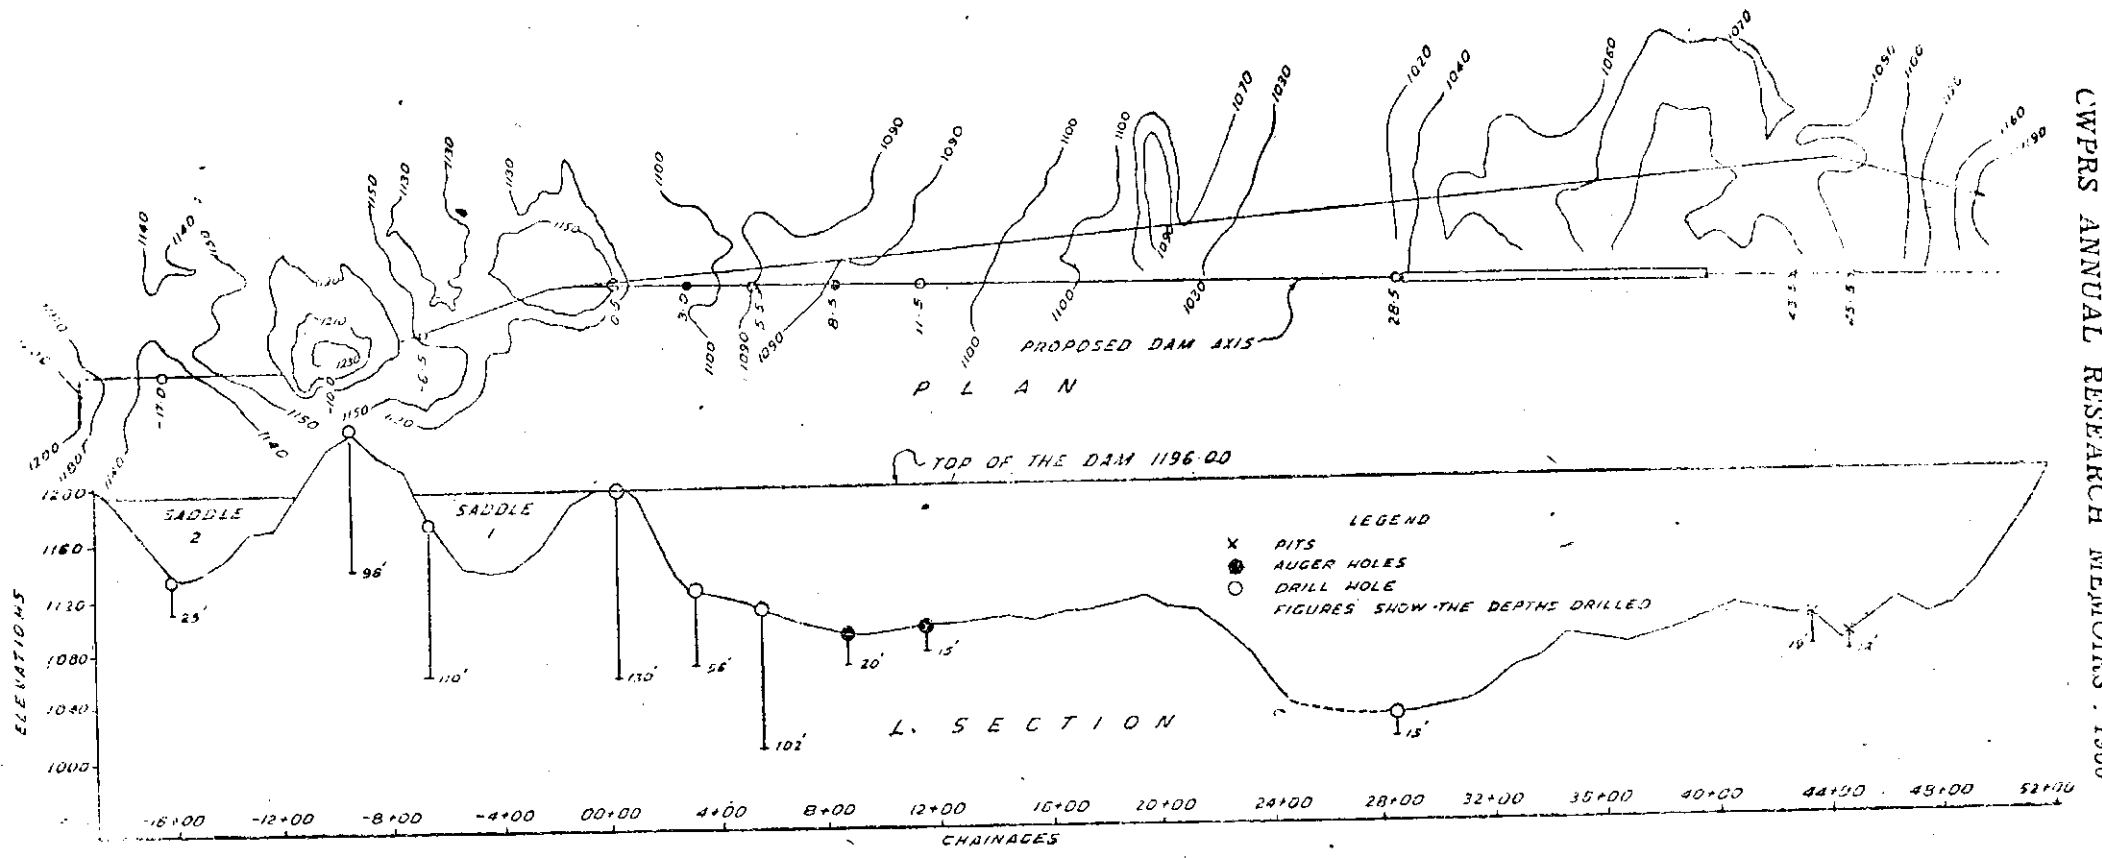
Tawa multipurpose project ; showing plan, L. section and location of drill & auger holes and pits tested
